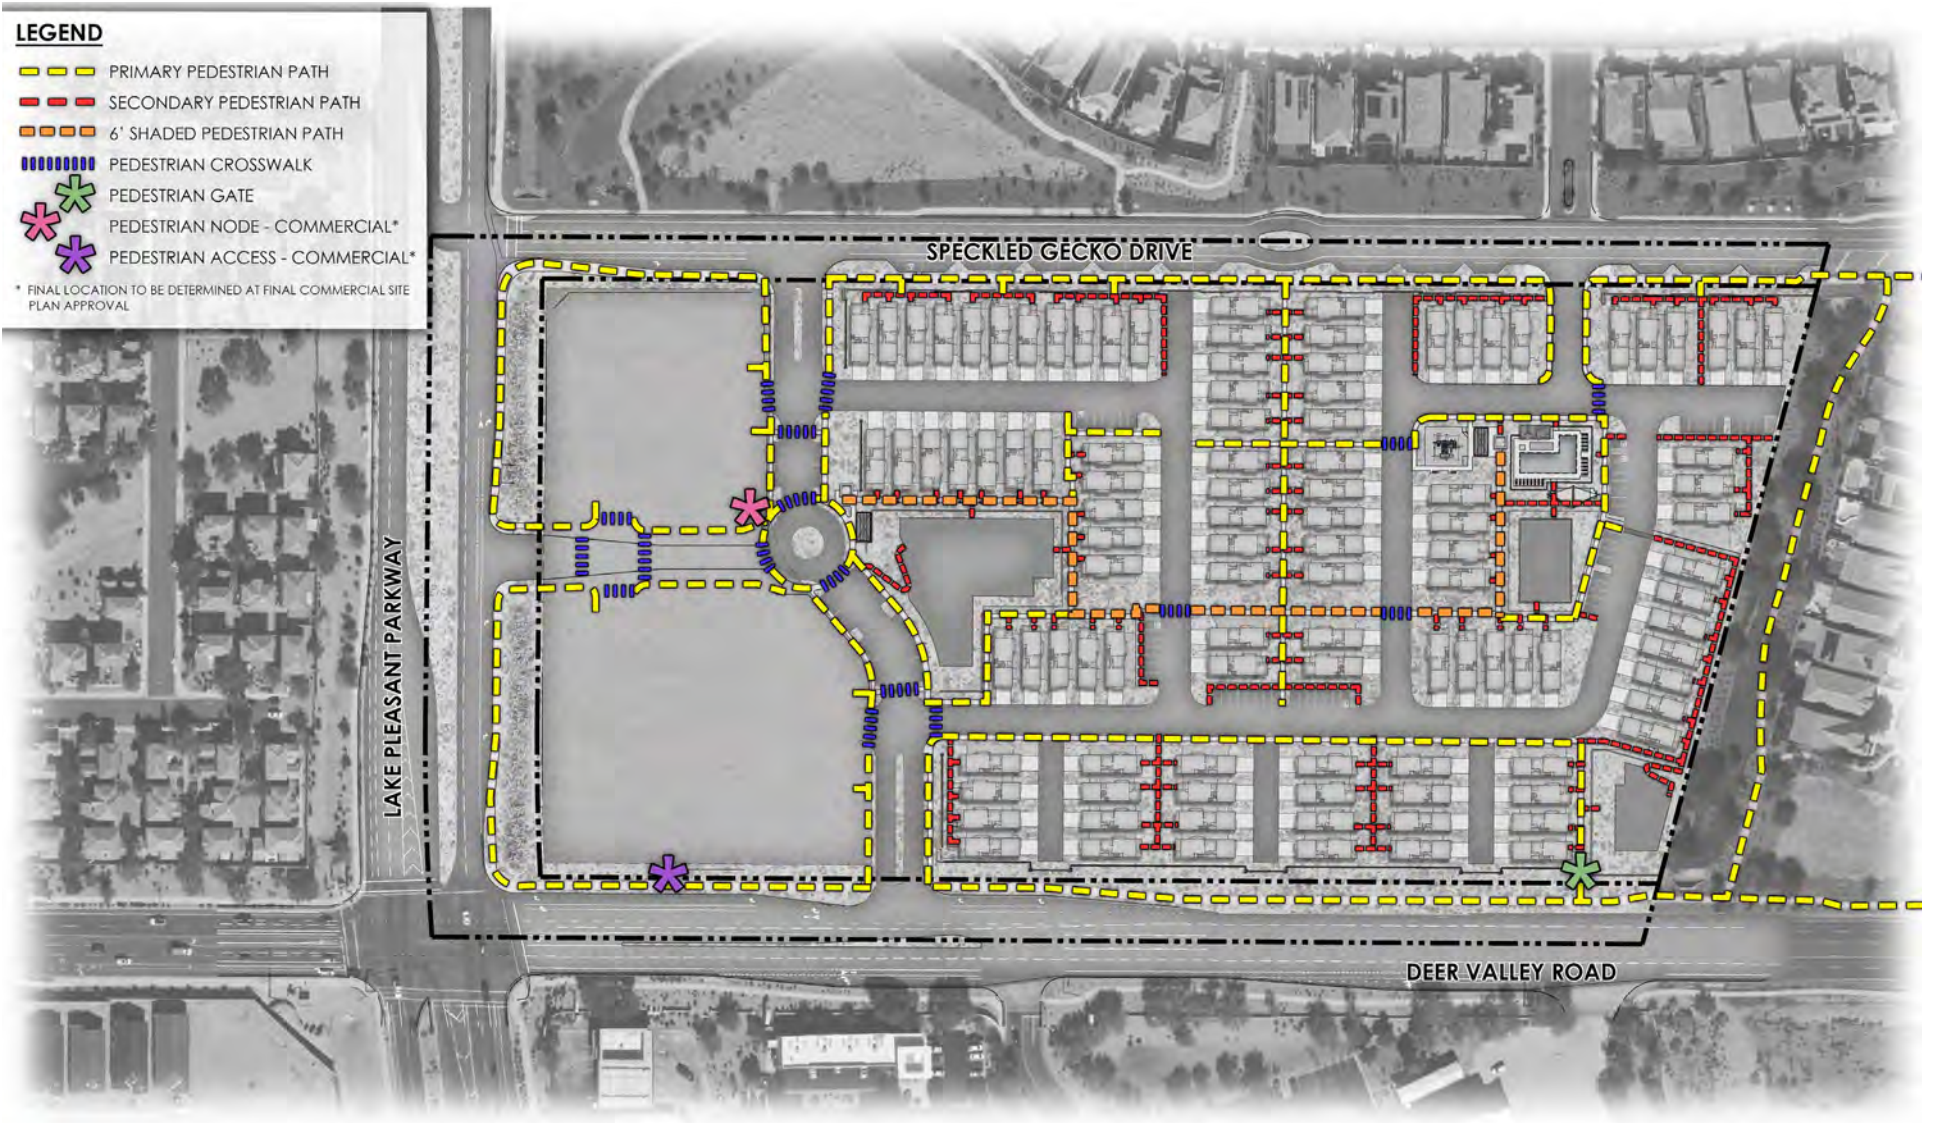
PEDESTRIAN CIRCULATION PLAN
